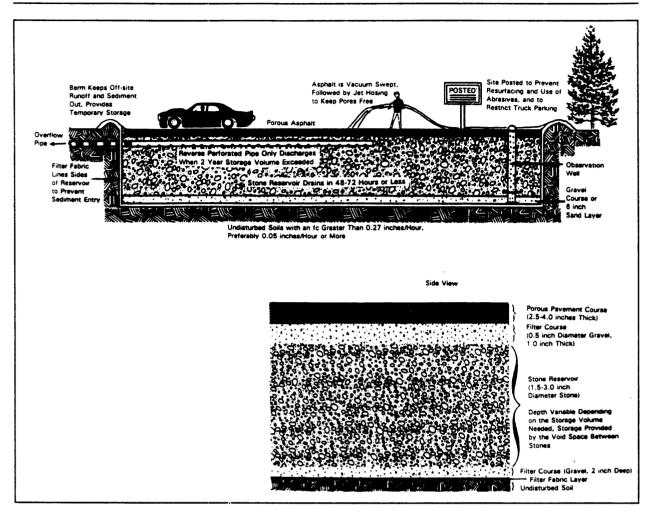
Schematic design of a porous pavement system (Schueler, 1987).
